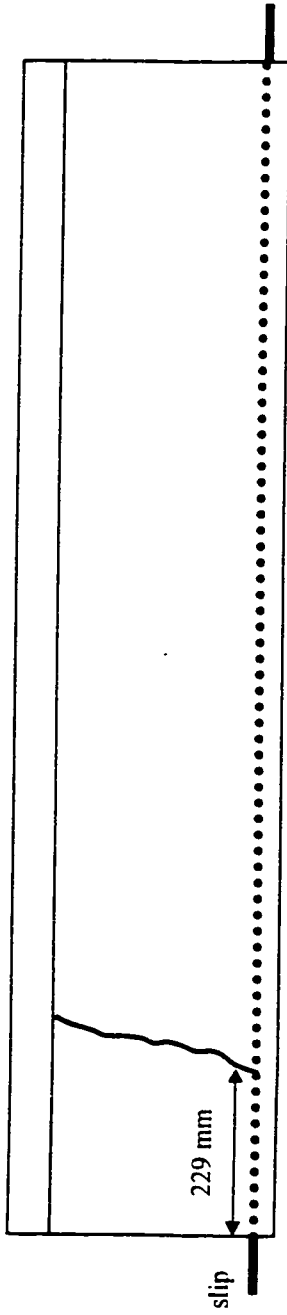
Crack pattern of beam G2-D9.79-B36(F1)
